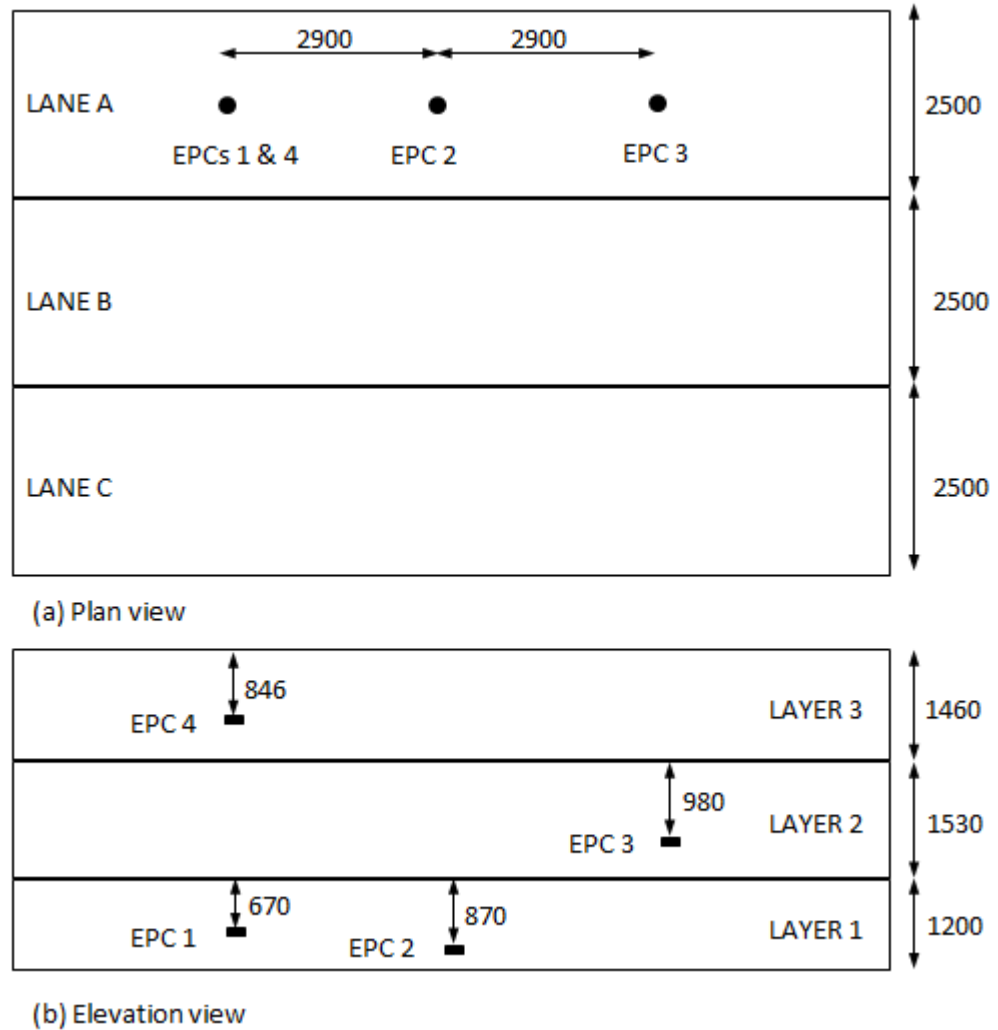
Plan and elevation views of test pad including EPC locations (all dimensions in mm)
